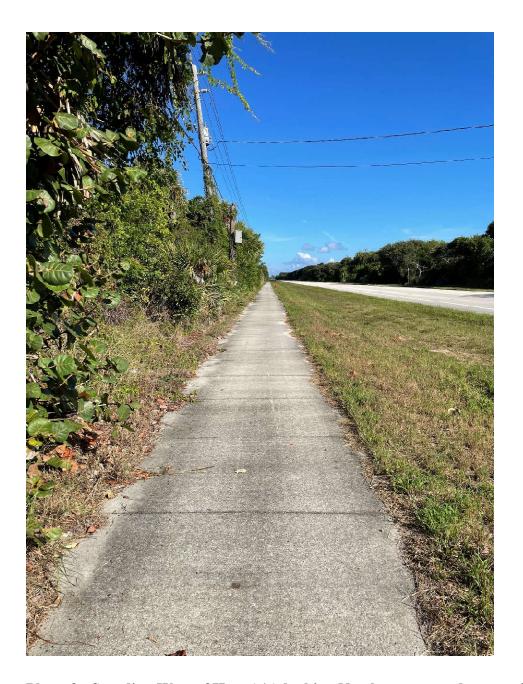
Standing West of Hwy A1A looking North at proposed connection location.
